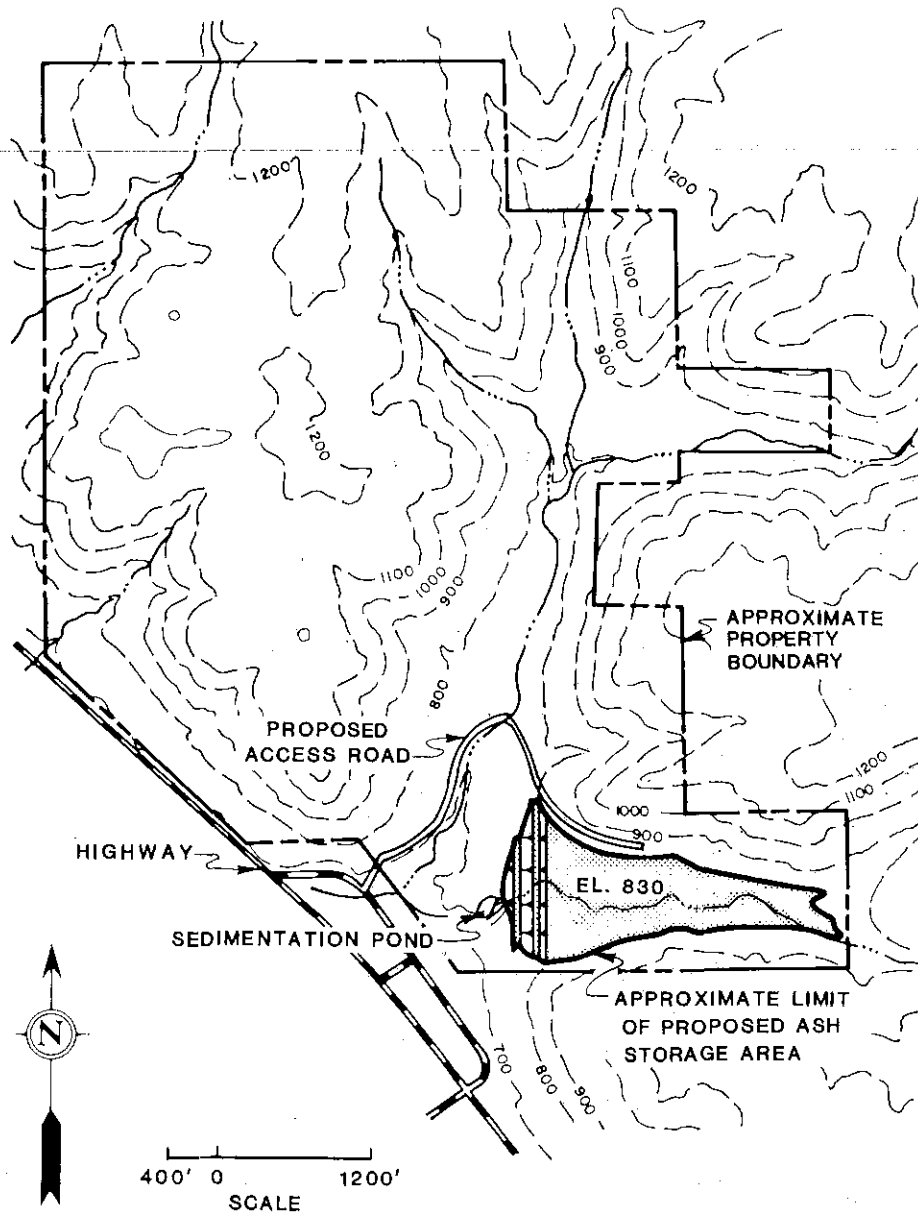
Case Study - Site 3 Conceptual Plan for Dry Ash Disposal Area
